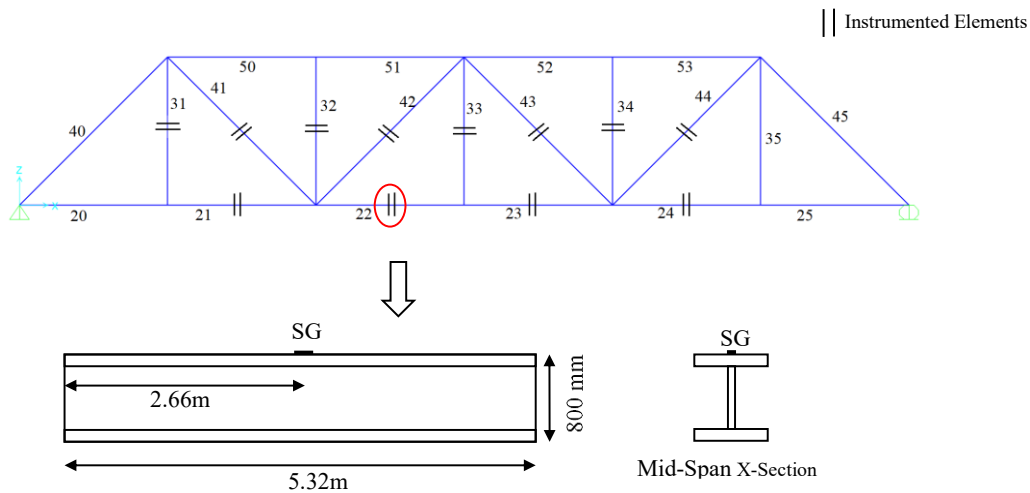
(top) The truss bridge elements instrumented with strain-gauges, (bottom) the longitudinal and cross-sectional profile of element 22 showing the location of strain measurement (not to scale)
